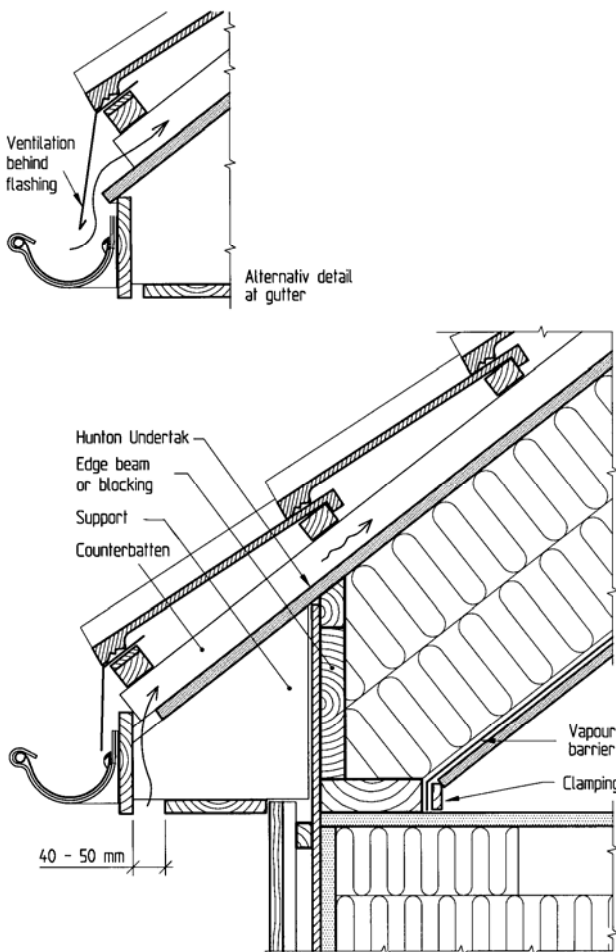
Example of connection between roof and exterior wall. The joint between the boards and the edge beam or blocking must be airtight, and the boards should be fastened here with max. 100 mm nail spacing.
